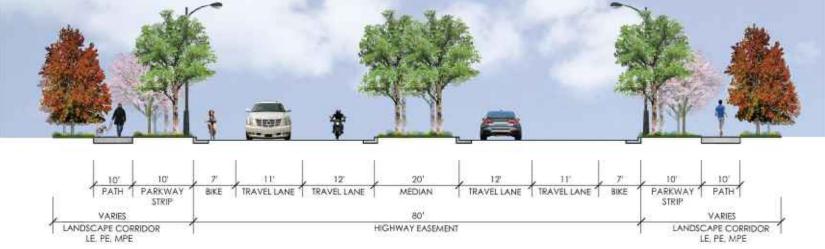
Sunset Boulevard-Section C, 4-Lane Arterial (Foothills Boulevard to Fiddyment Road)
